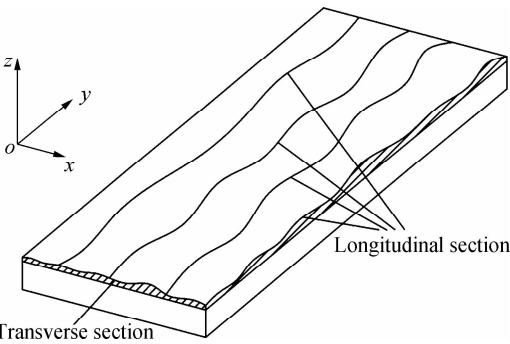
Transverse and longitudinal sections of three-dimensional asphalt pavement
